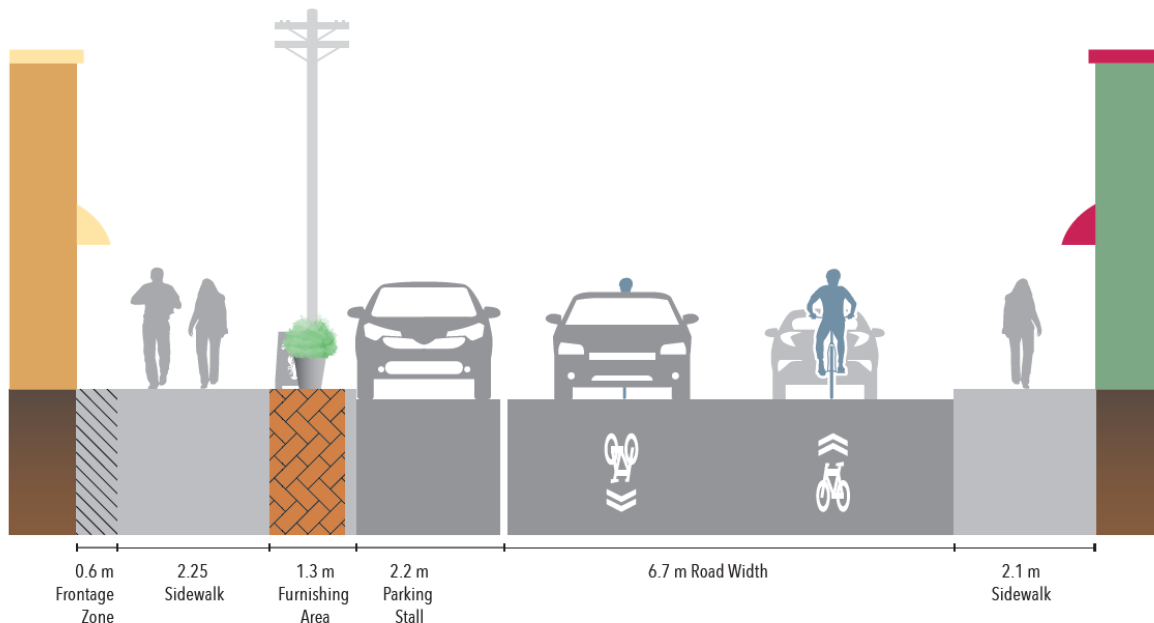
Montague Street, typical cross-section from King Street to Rum Row
